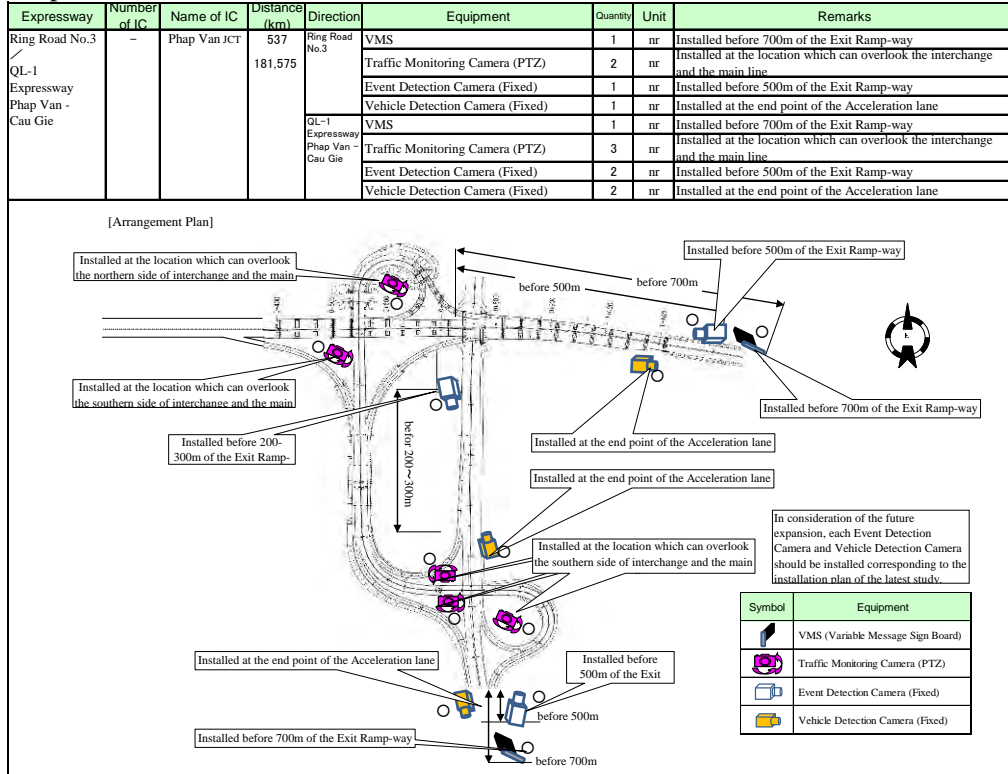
Equipment Layout Plan at Phap Van Junction
